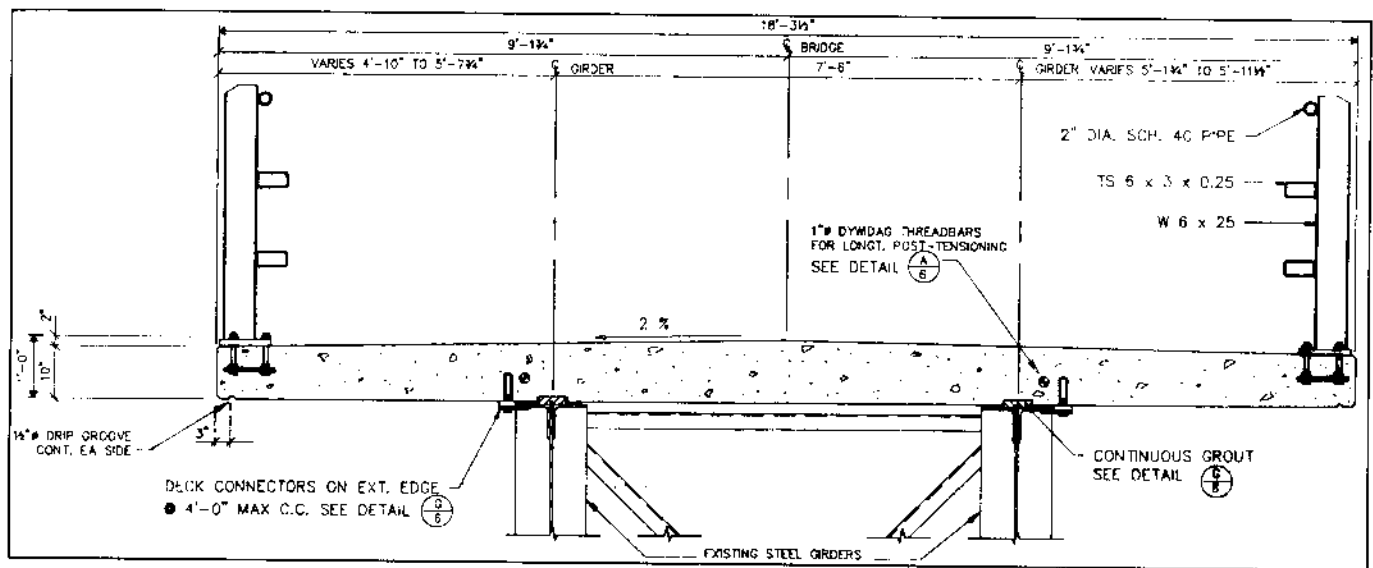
Typical section of laterally prestressed, transversely reinforced deck slab to be longitudinally post-tensioned in place.
